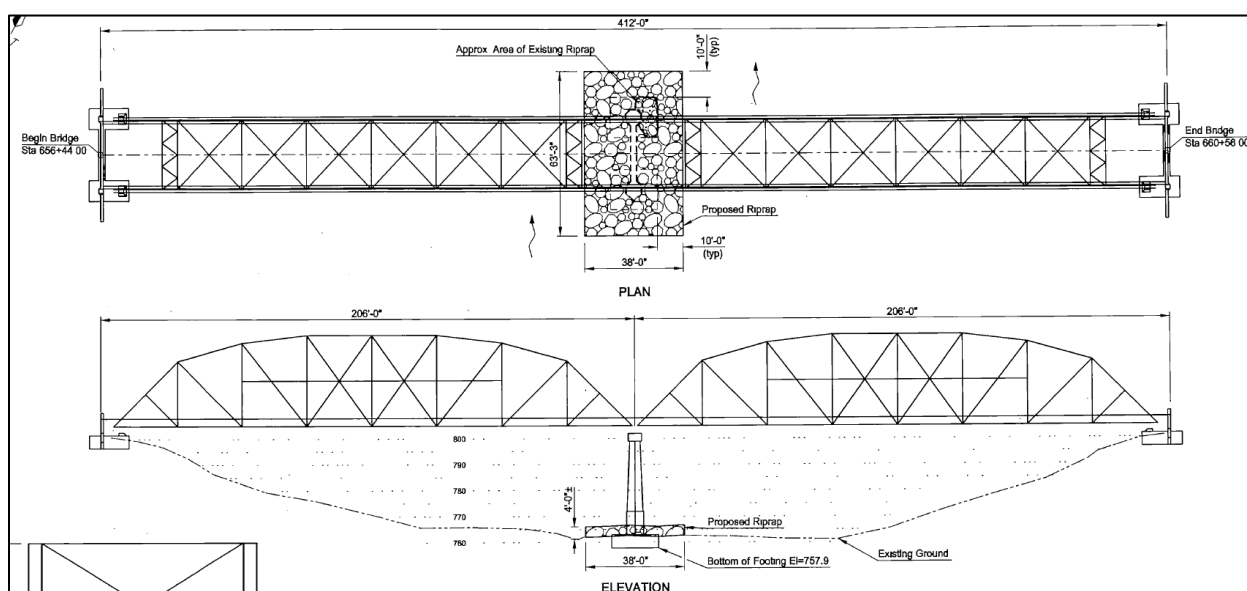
Engineering drawing showing elevation view of the Highway 17 Bridge near Grafton.
